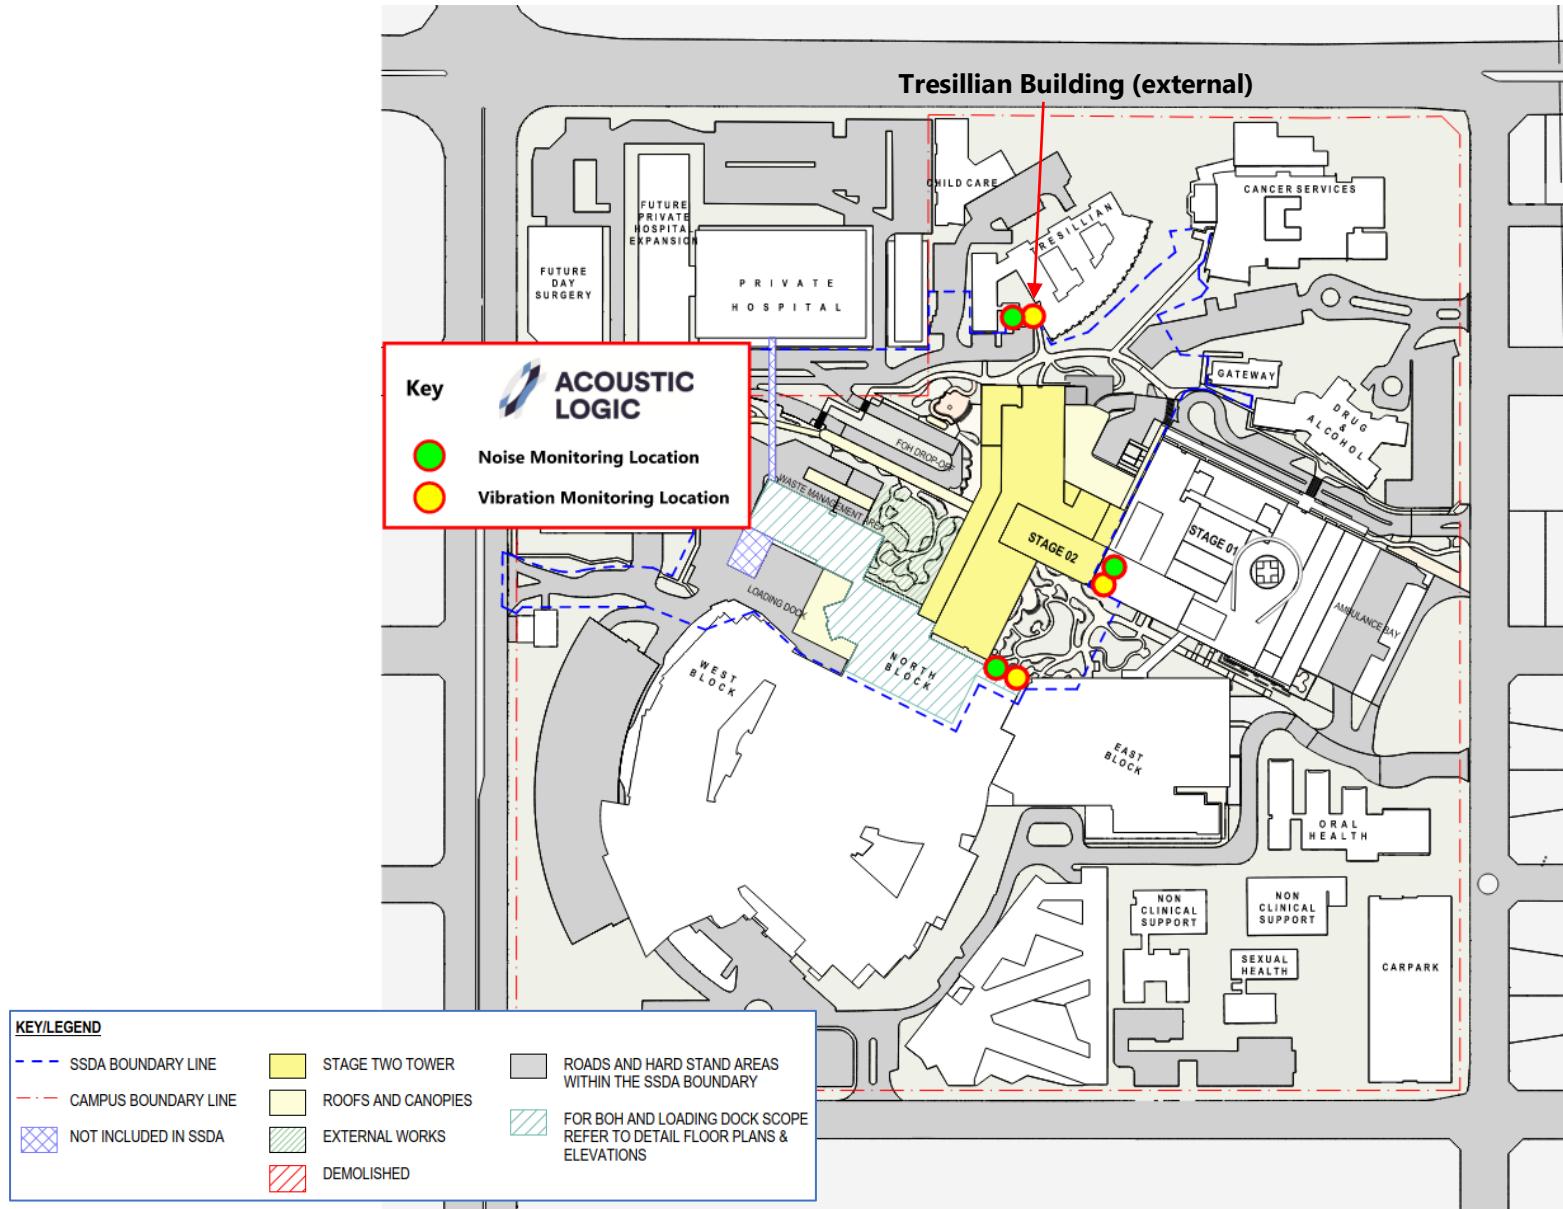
Stage 2 Site Plan and Monitoring Locations (Source: BVN)
